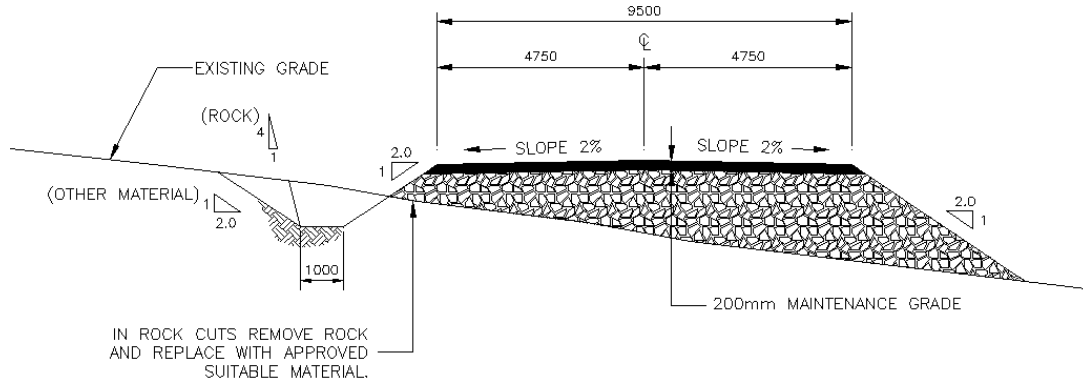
Typical Section for New Permanent Road (Reference 1)
